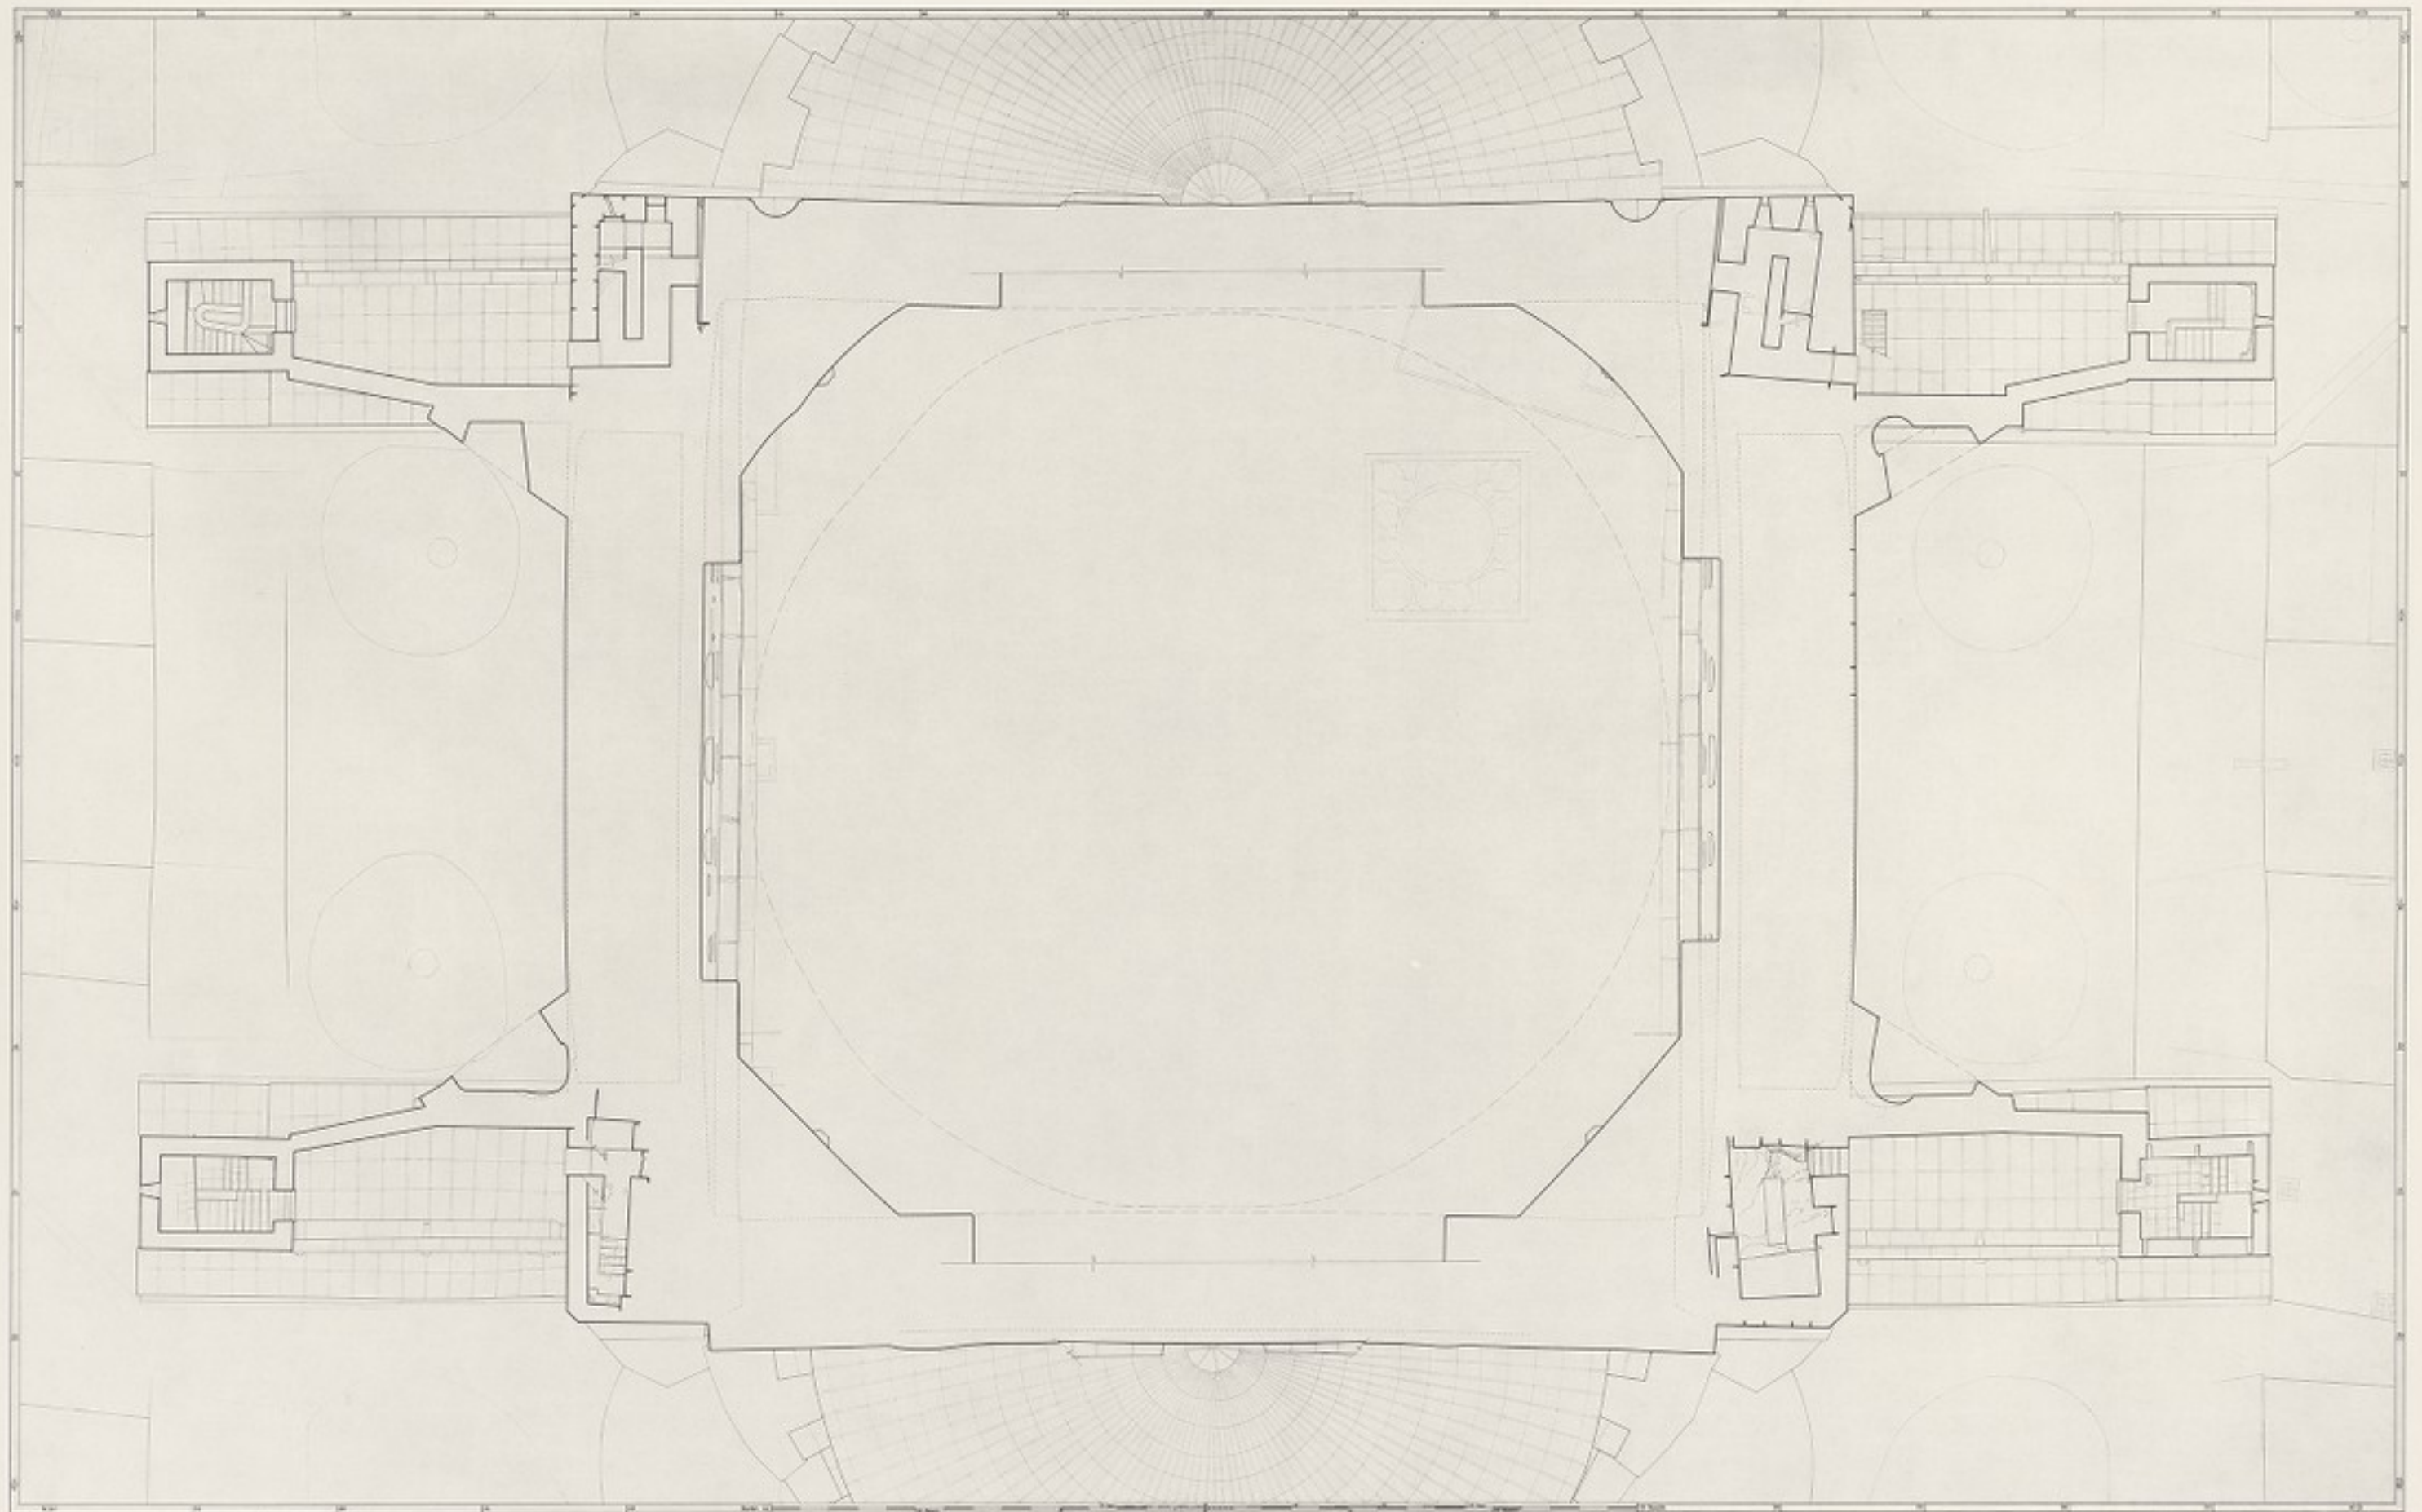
PLAN AT LEVEL OF BUTTRESS ROOFS,
